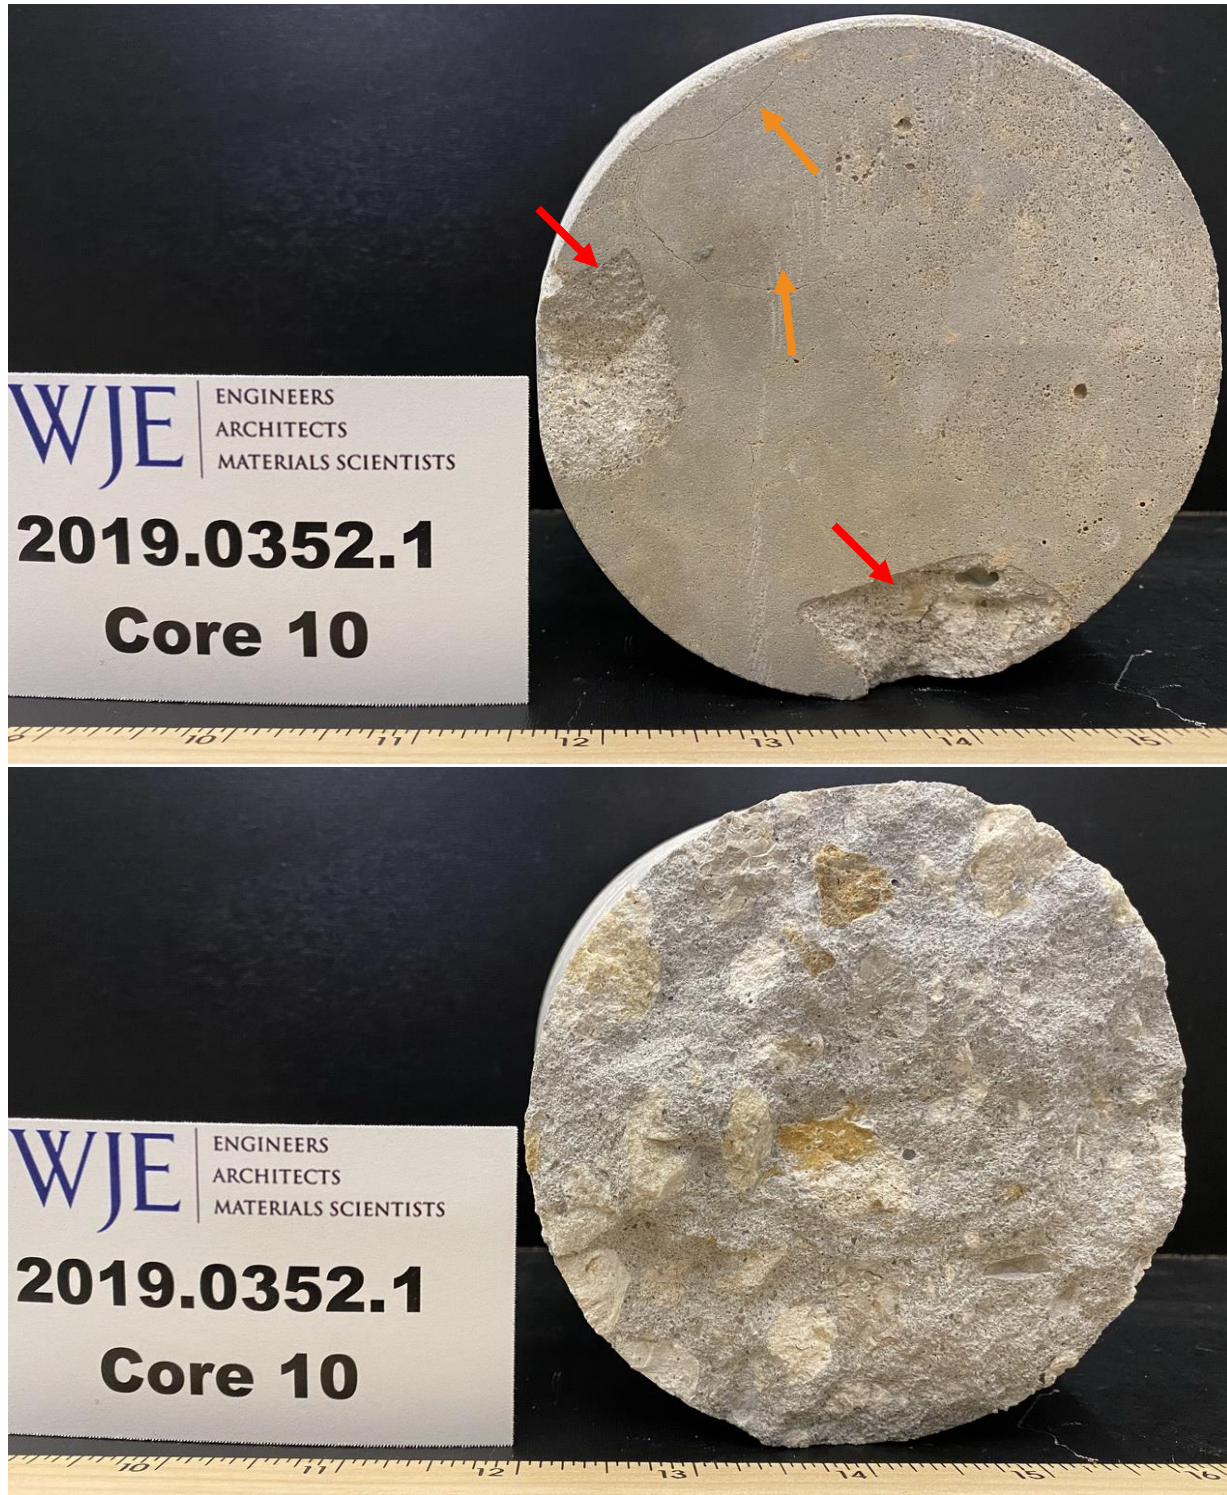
Core 1. Exterior (exposed) surface (top photo) and interior surface (bottom). Arrows indicate surface spalling or loss that was probably due to coring. The fractured surface extended mainly through coarse aggregate particles, consistent with a tight paste-aggregate bond. Orange arrows indicate hairline cracks. As-received.
